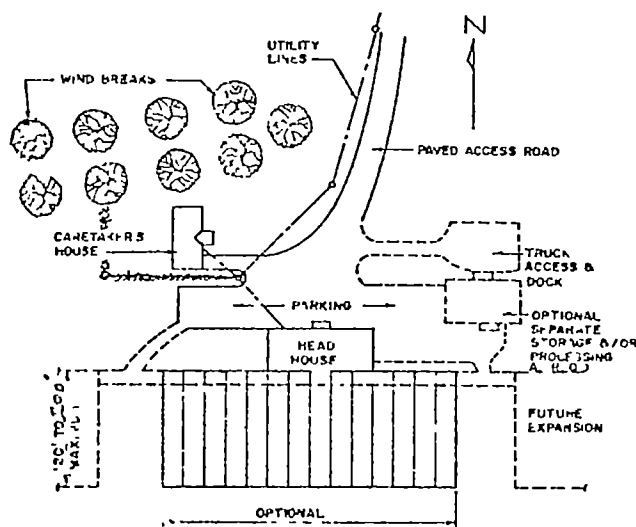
Typical greenhouse range layout on a level but well drained, southerly exposed site.
